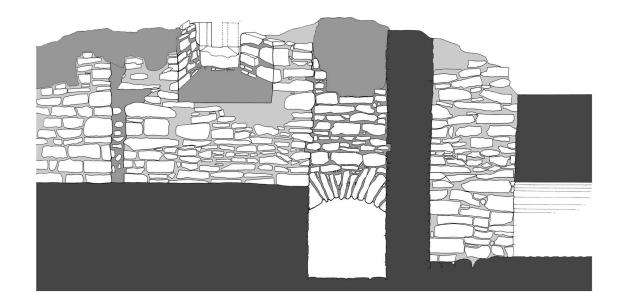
West section building elevation of wall (5036), showing the lancet window and garderobe (5051).
